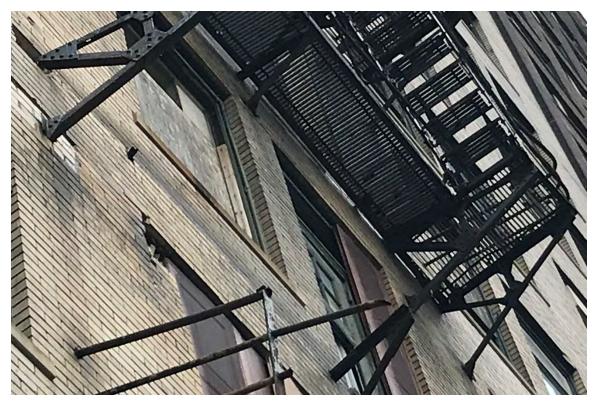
Exterior, Fire Escape Detail, Looking Up. 7/15/19
